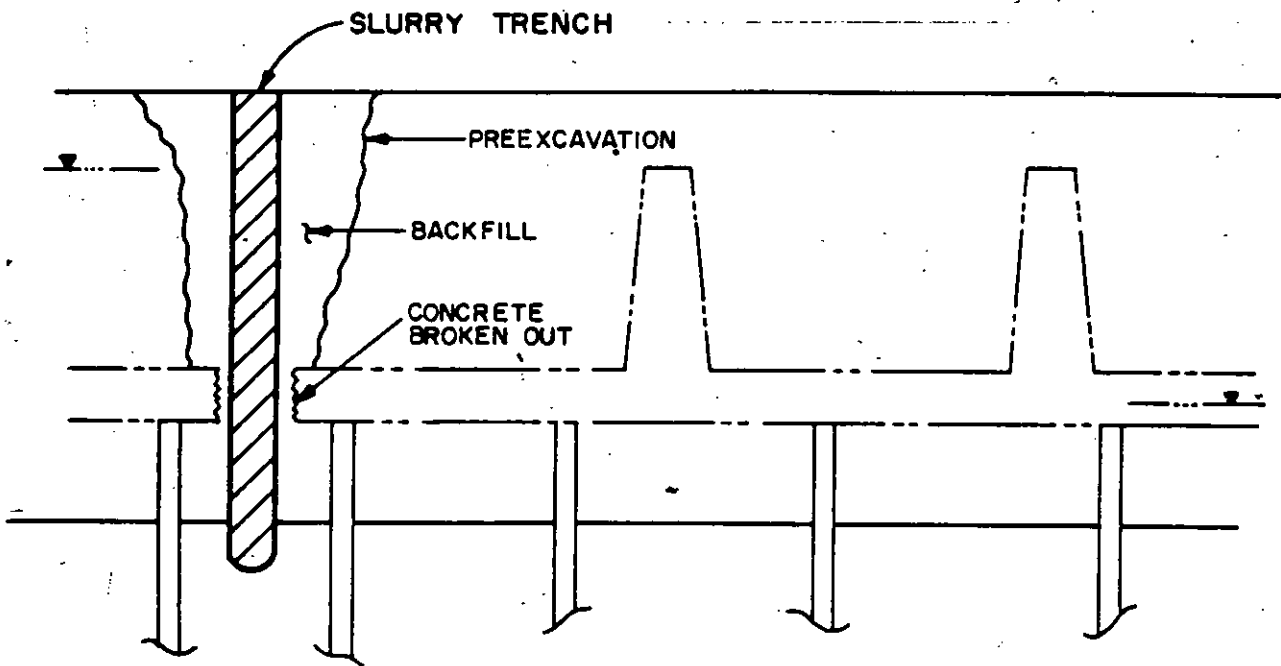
DETAIL OF SLURRY CUT-OFF SOLUTION
